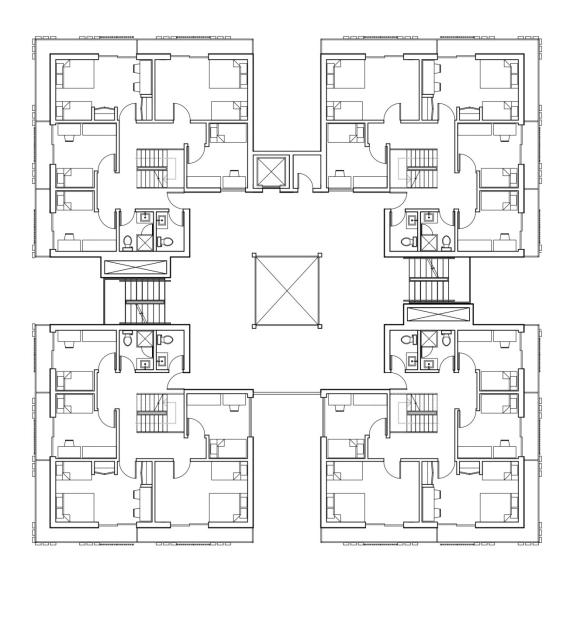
Transitional housing node: Typical floor plan (Second and fourth floor plan)
